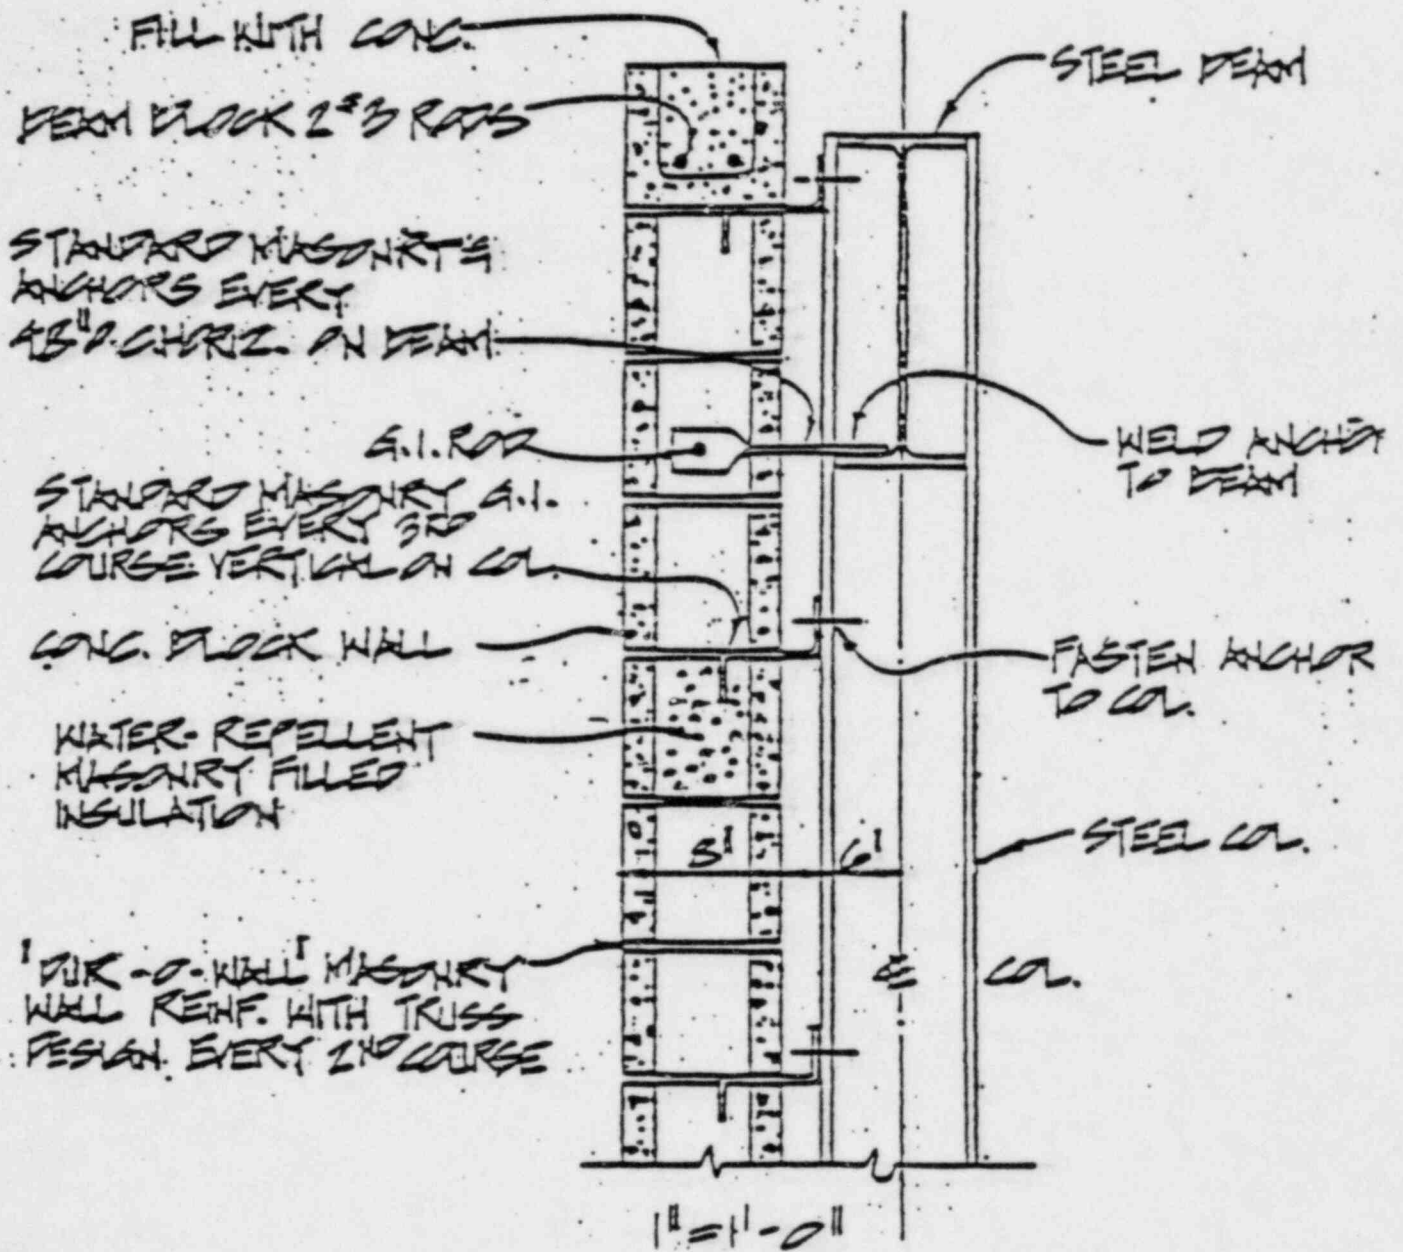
Typical exterior wall detail (existing). Diesel Generator Building.
